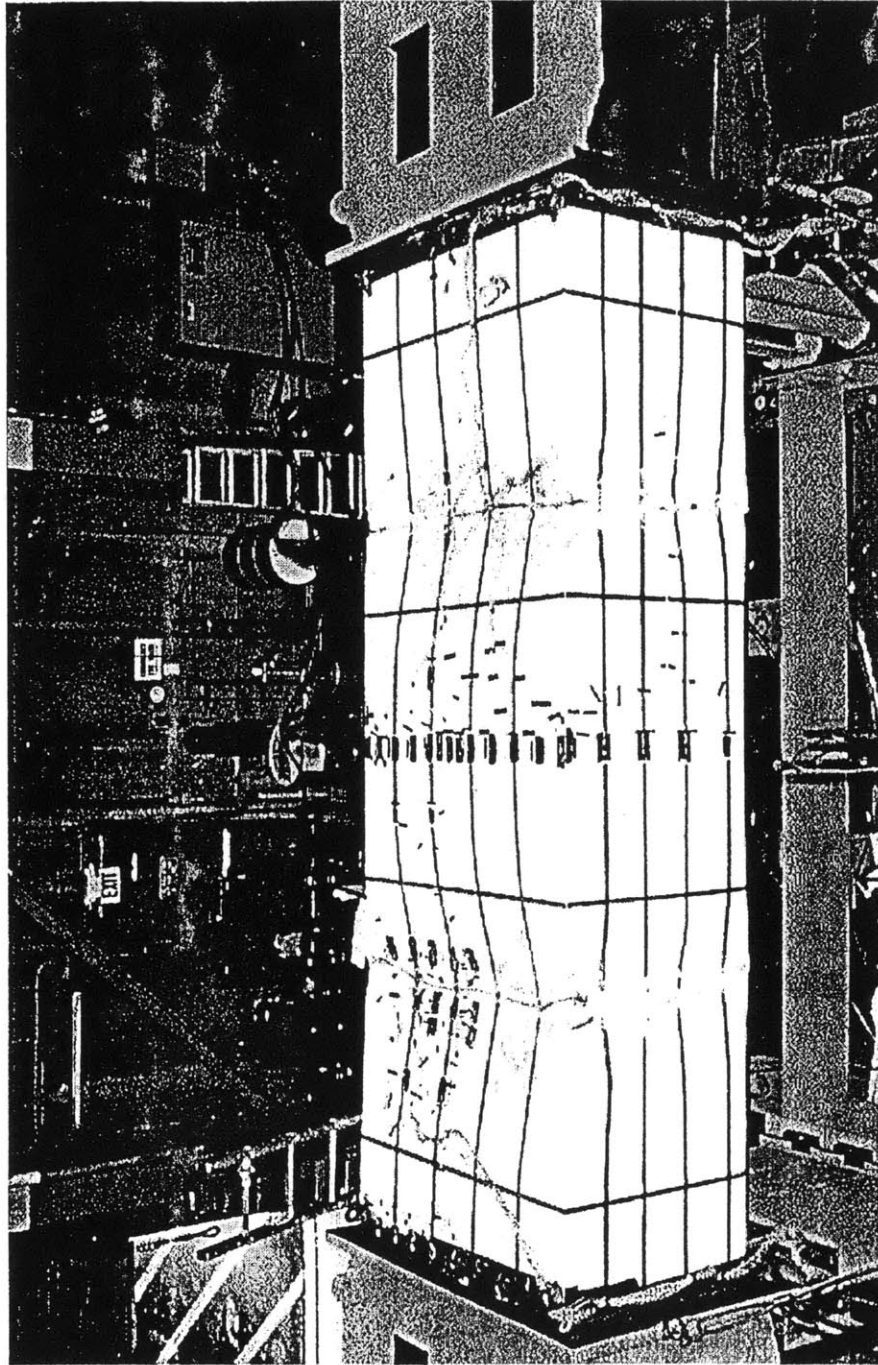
Box girder representing ship's hull loaded in bending/compression developed fracture at the corners. (Courtesy of NSWCC)
